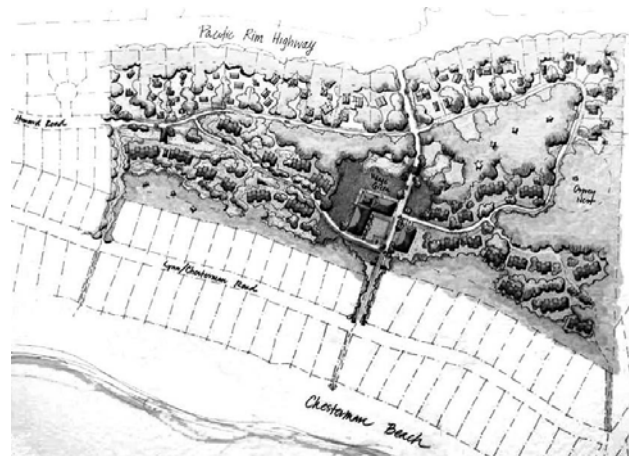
Pedestrian Oriented Green Infrastructure Plan for Chesterman Beach
